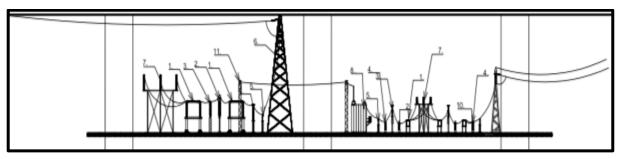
Typical cross-section of substation (Source: BPC, 2017)
